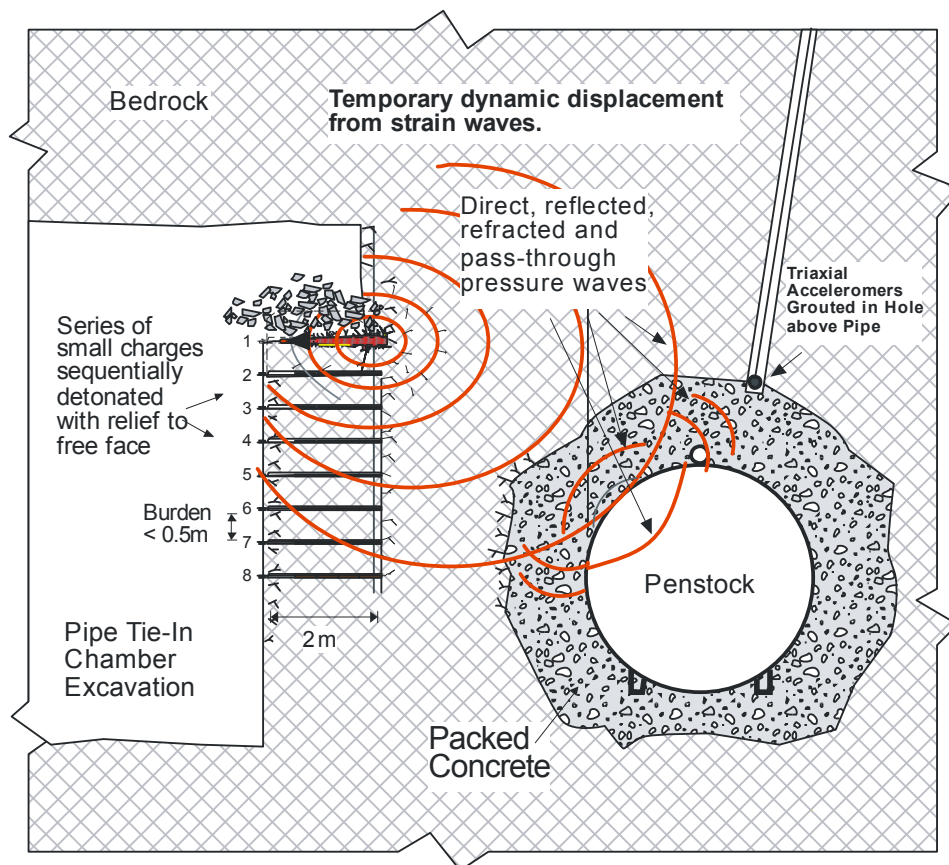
Configuration of Penstock and Blasted Connection Chamber
